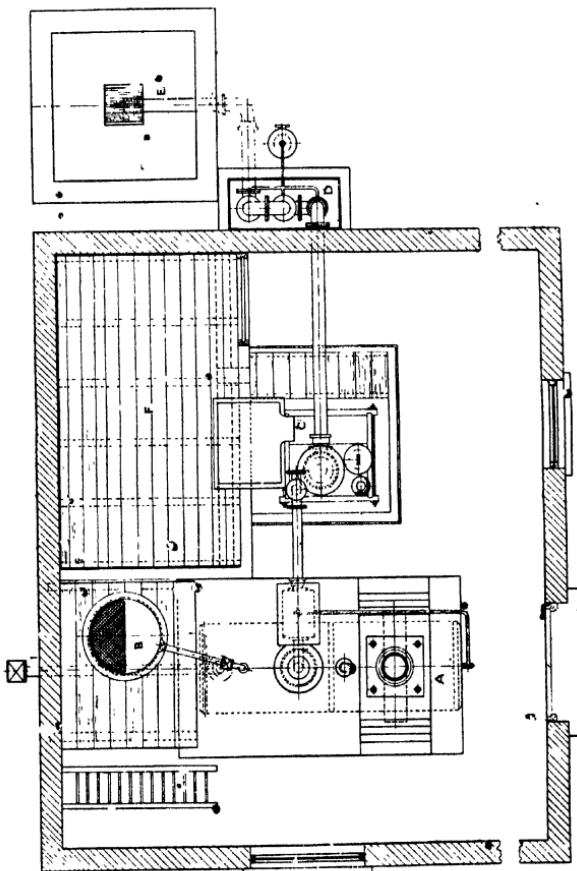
C. & W. Walker's Intermittent Sulphate Plant for Small Works. Plan.
